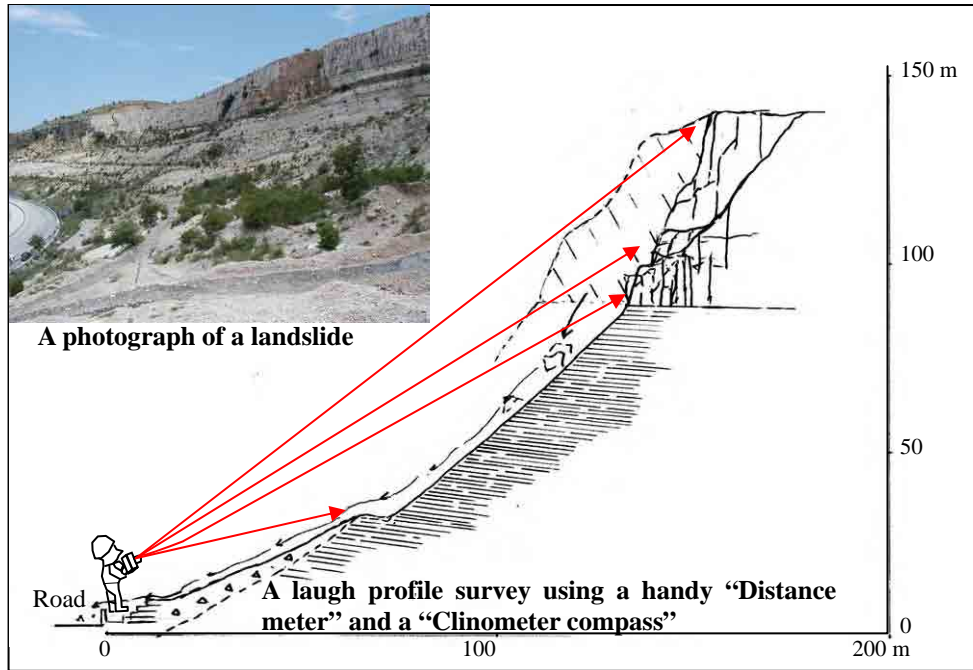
A Laugh Profiling Survey of Landslide (Source: JICA Study Team)
